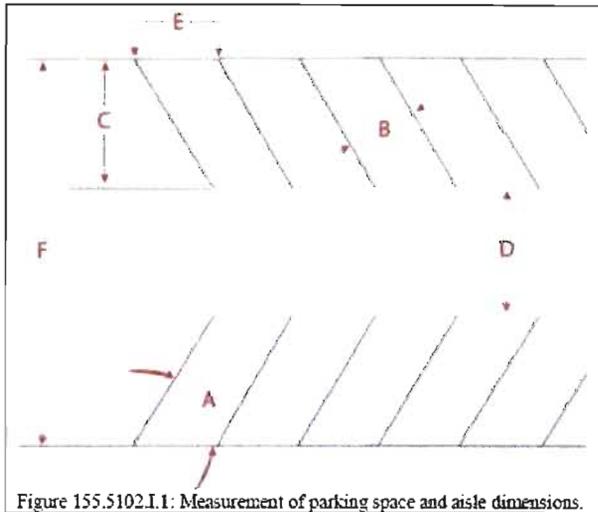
I.1: Measurement of parking space and aisle dimensions
